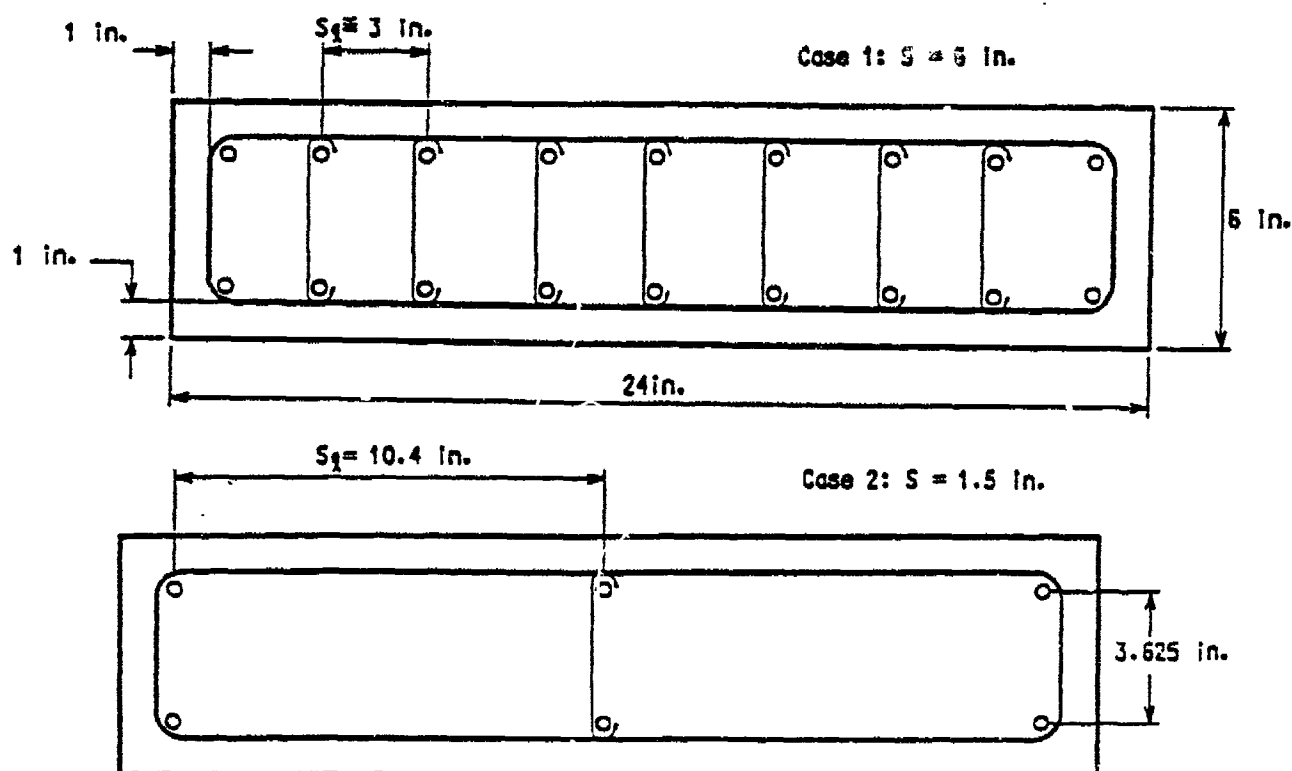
Example Reinforcement Options for 24-Inch-Wide, 6-Inch-Thick Normal Strength Concrete Slab.
